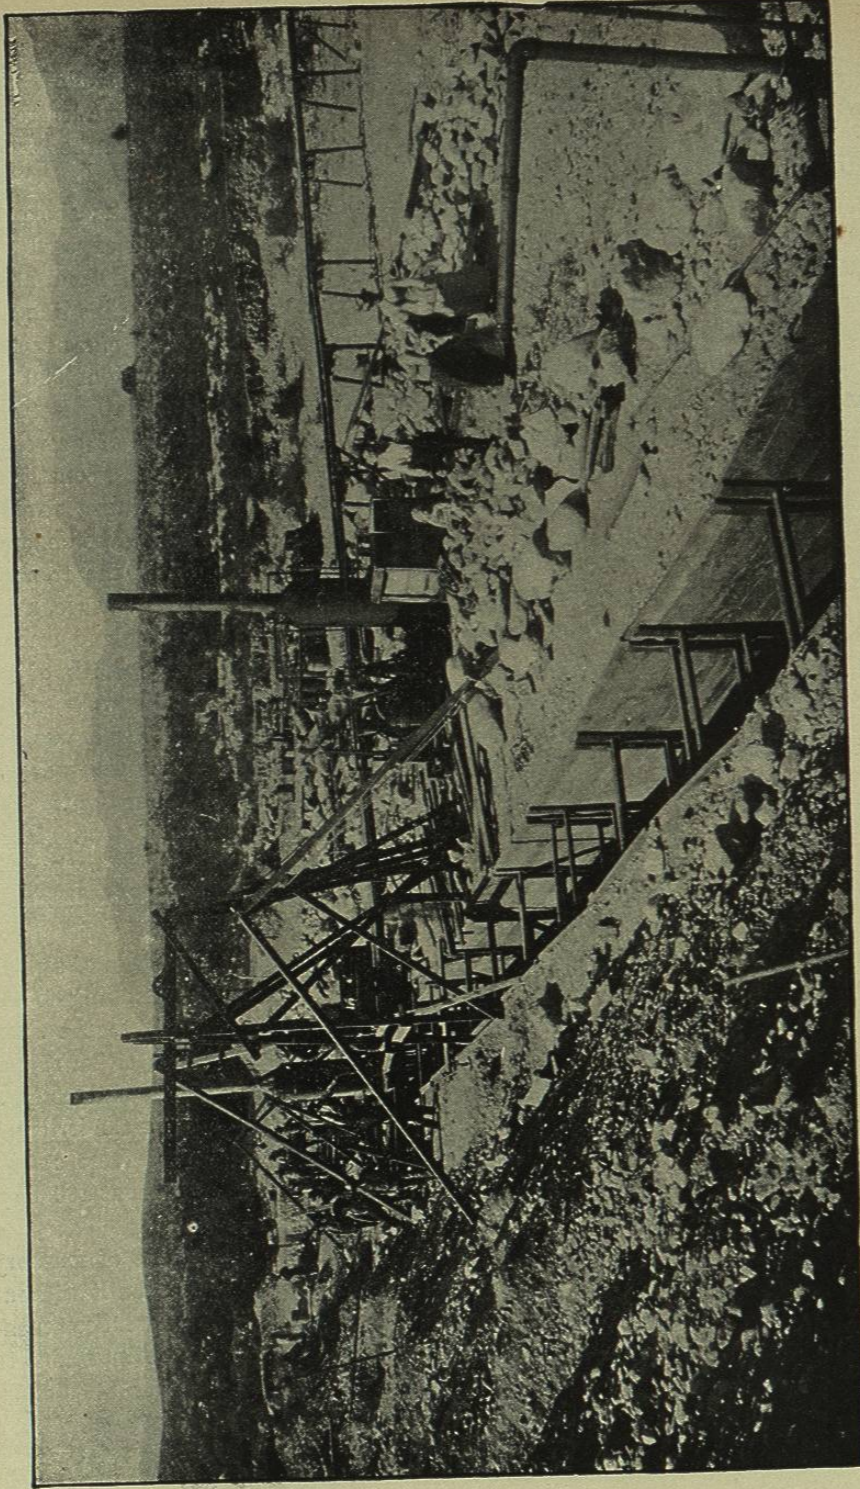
EXCAVATION OF TRENCH FOR PACOIMA SUBTERRANEAN DAM.
